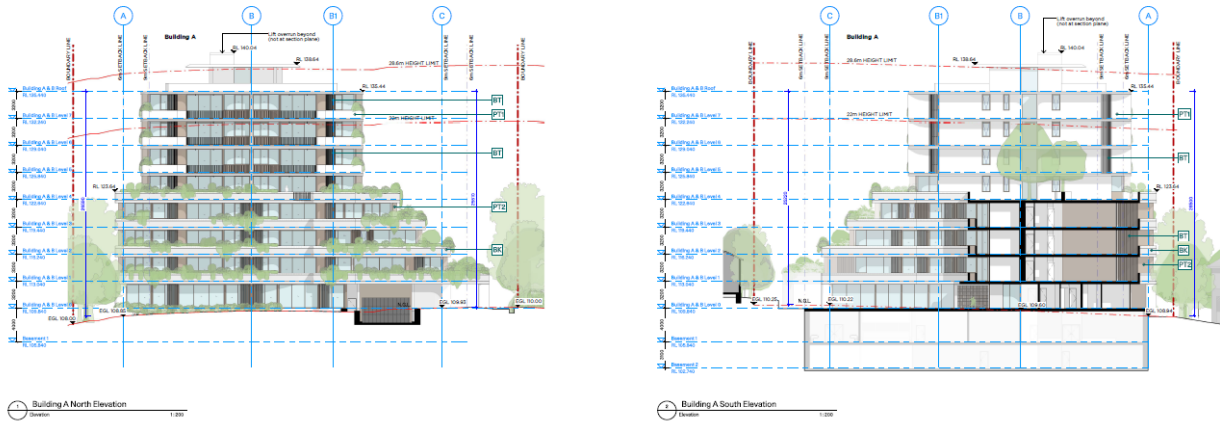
Extract of the north and south elevations of Building A, showing the primary façade fronting McIntosh Street (northern elevation).
